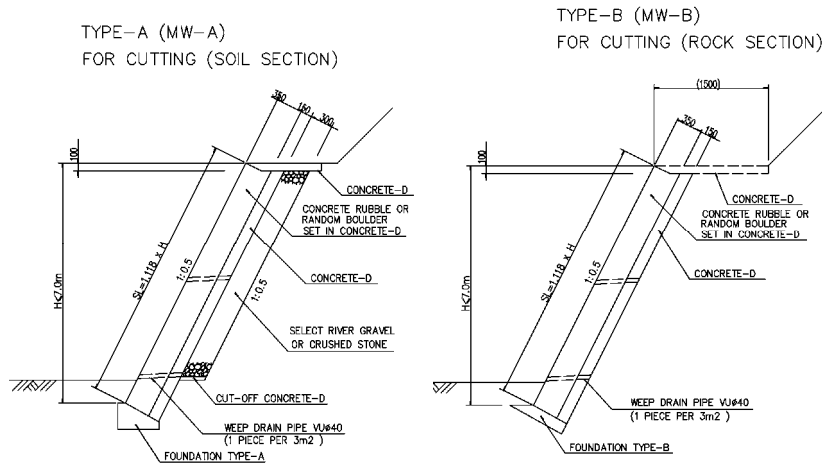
Wet Stone Masonry Wall (Type-A and Type-B)
